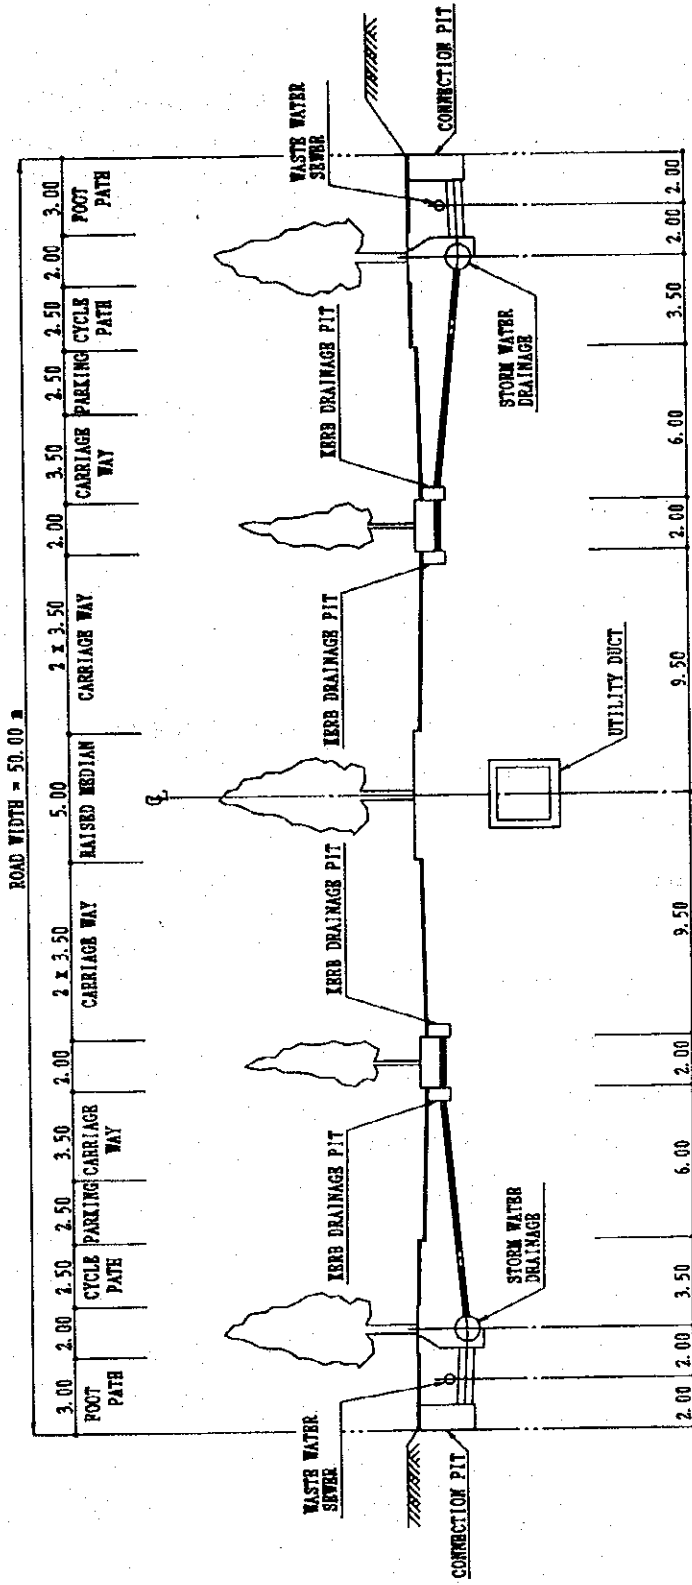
TYPICAL ROAD CROSS-SECTIONS FOR DRAINAGE ( FOR CLASS - 5 BOULEVARD )
